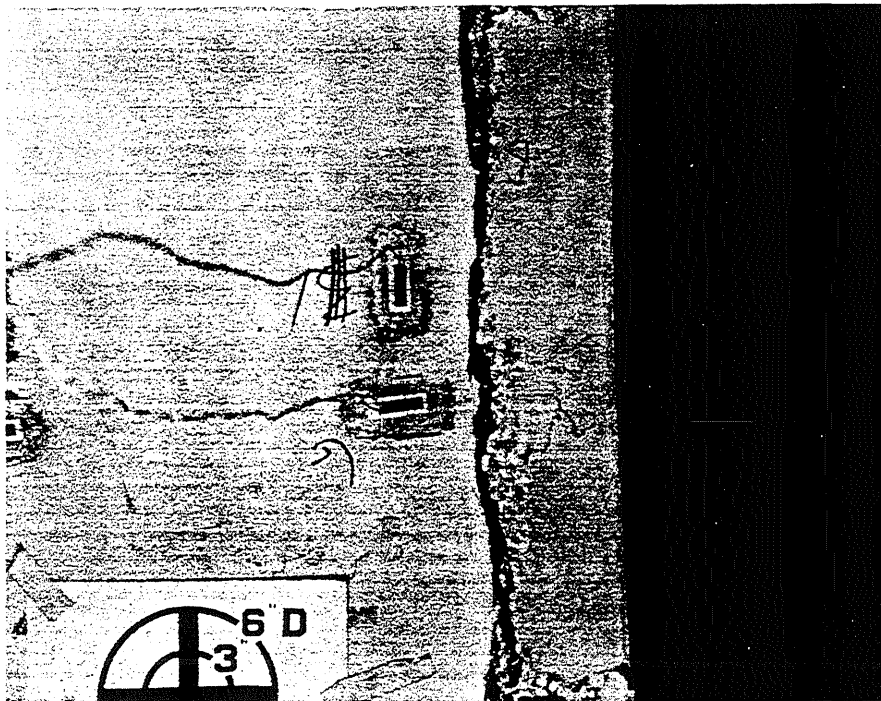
CRACK ON BOTTOM FACE OF B7
